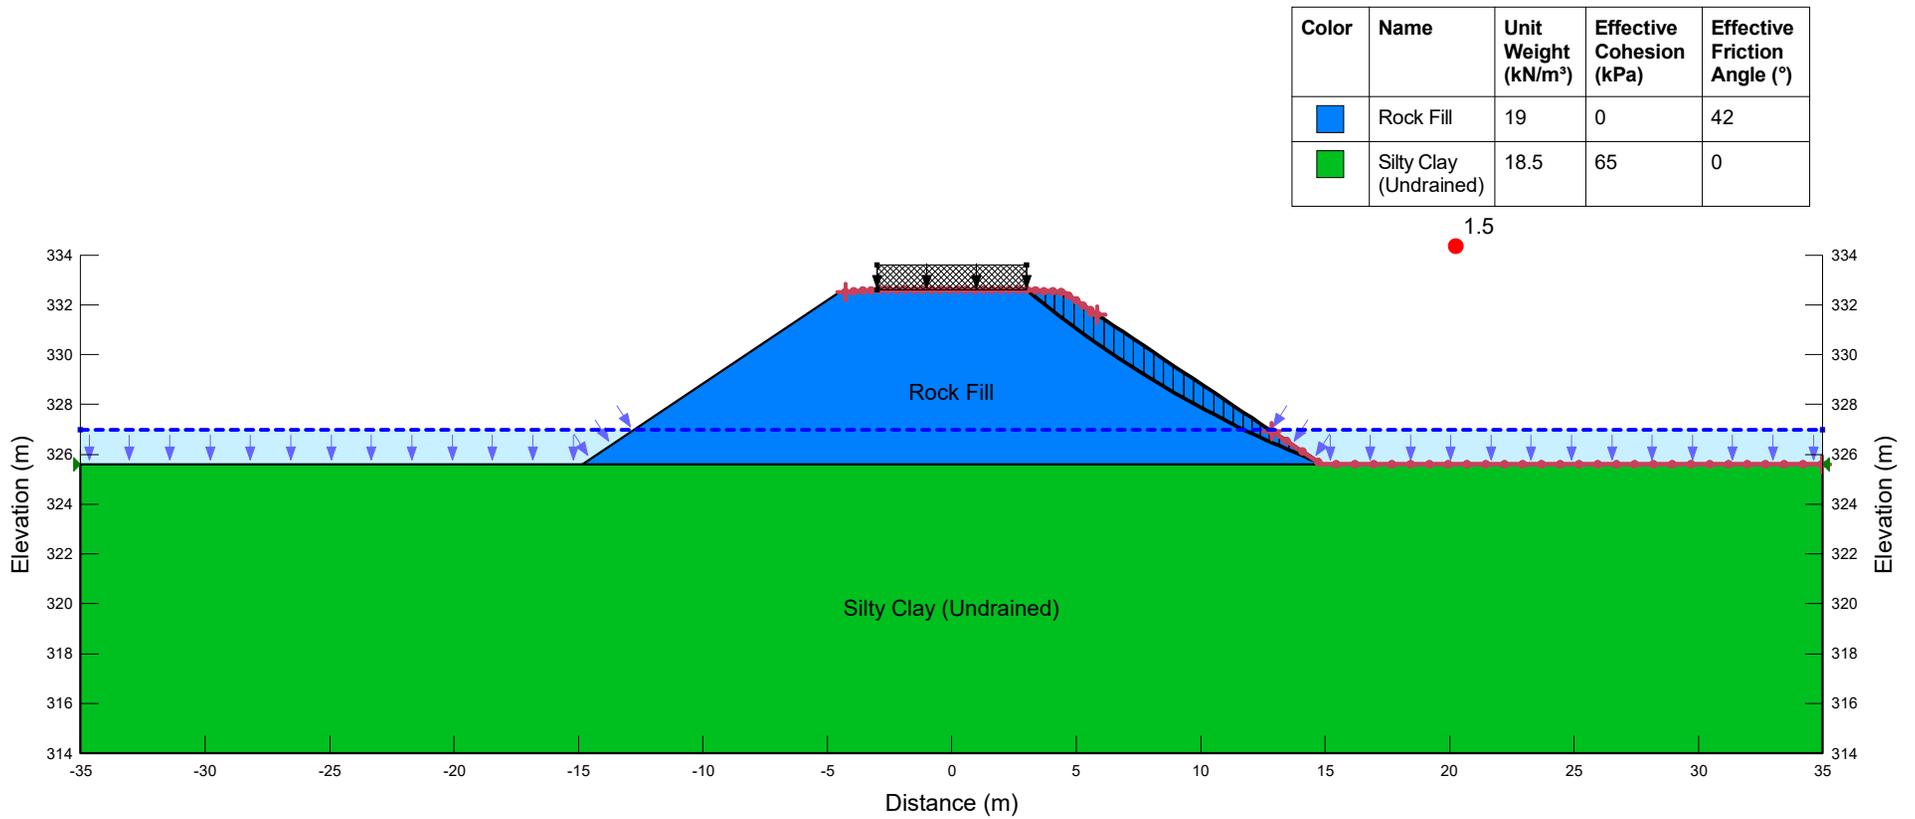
Lyon Creek Culvert Replacement - Rock Fill with Slope 1.5:1 [Undrained Analysis]
